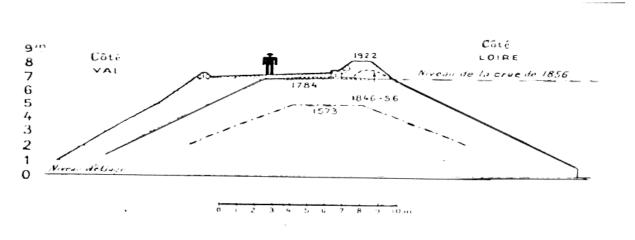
A typical cross section of the historic reinforcement of Loire levees
